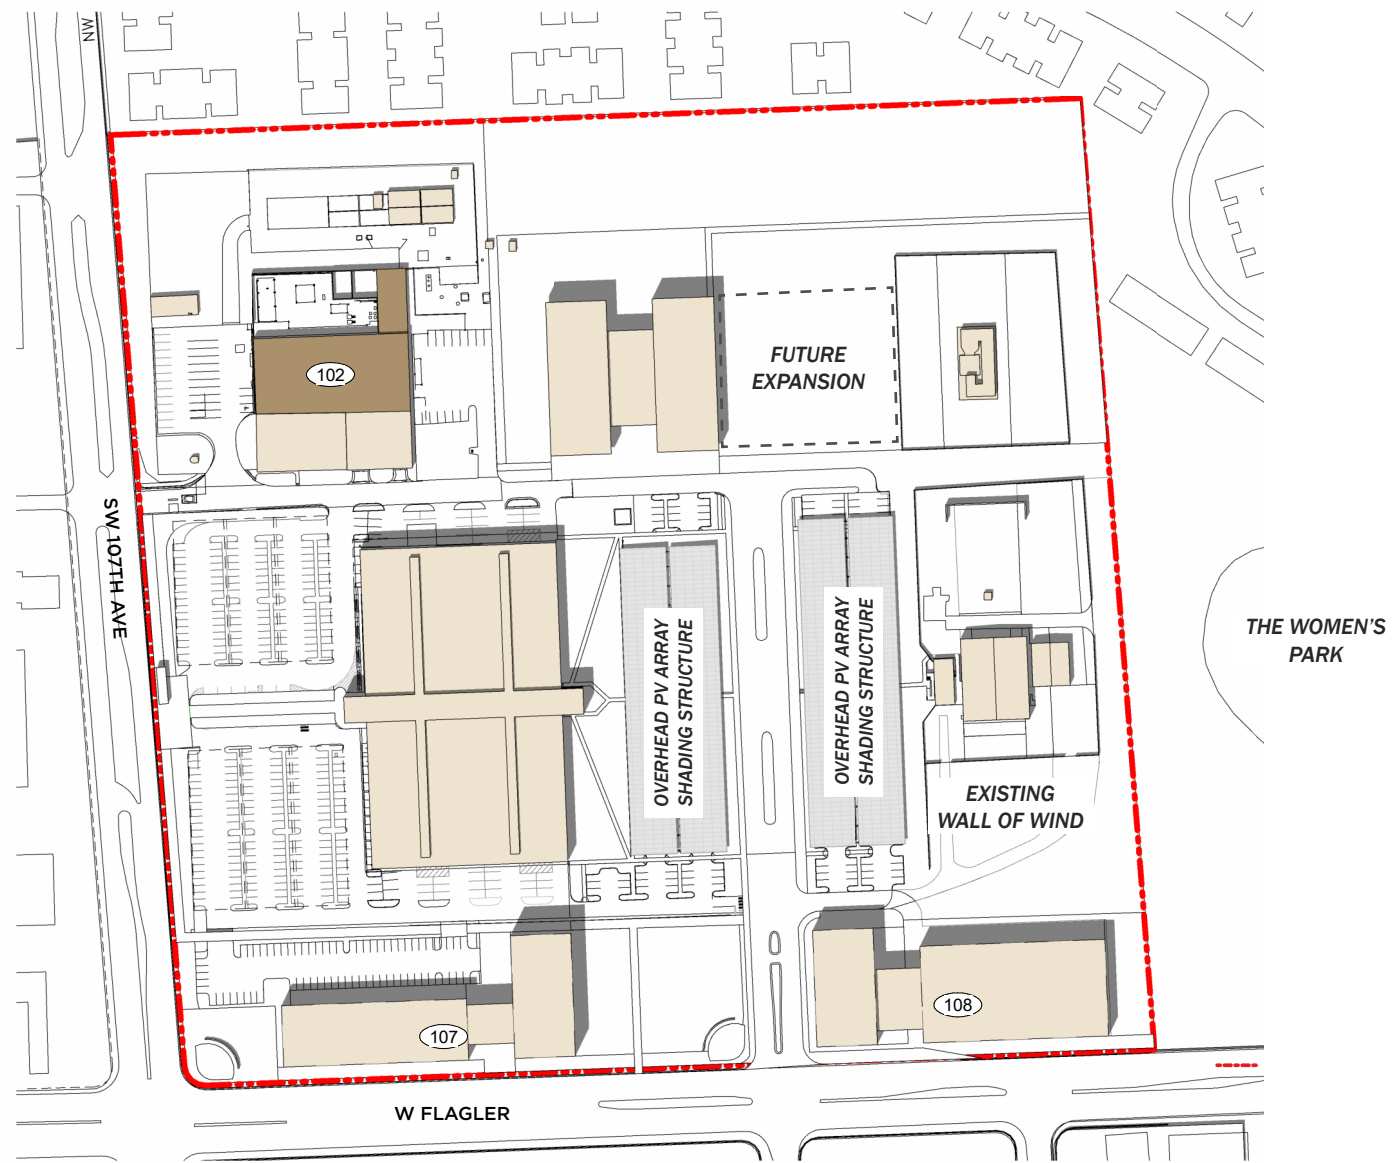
EC 2035 PLAN SUPPORT FACILITIES
